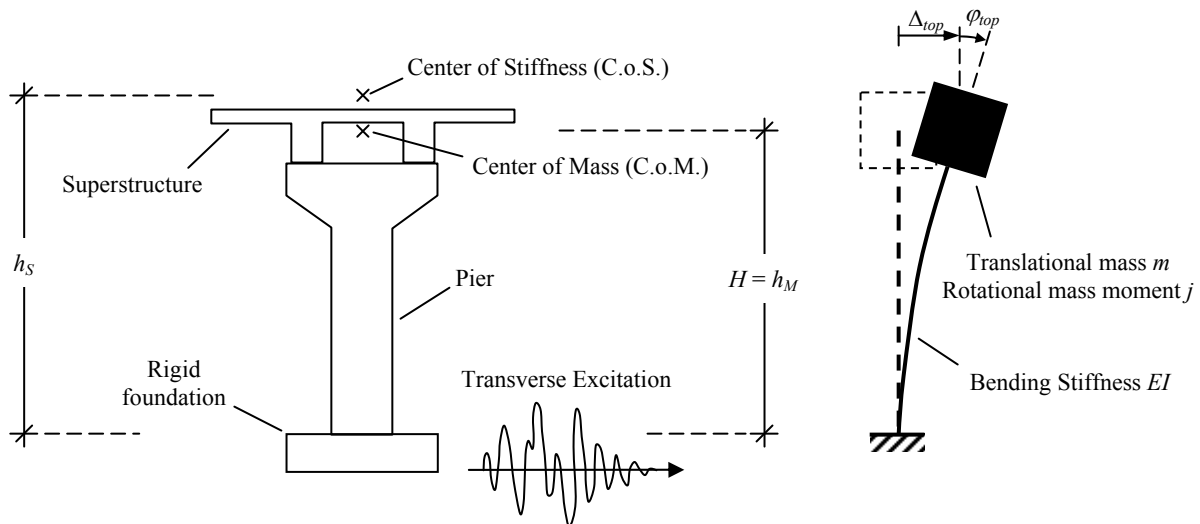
Elevation of regular bridge pier in transverse direction
